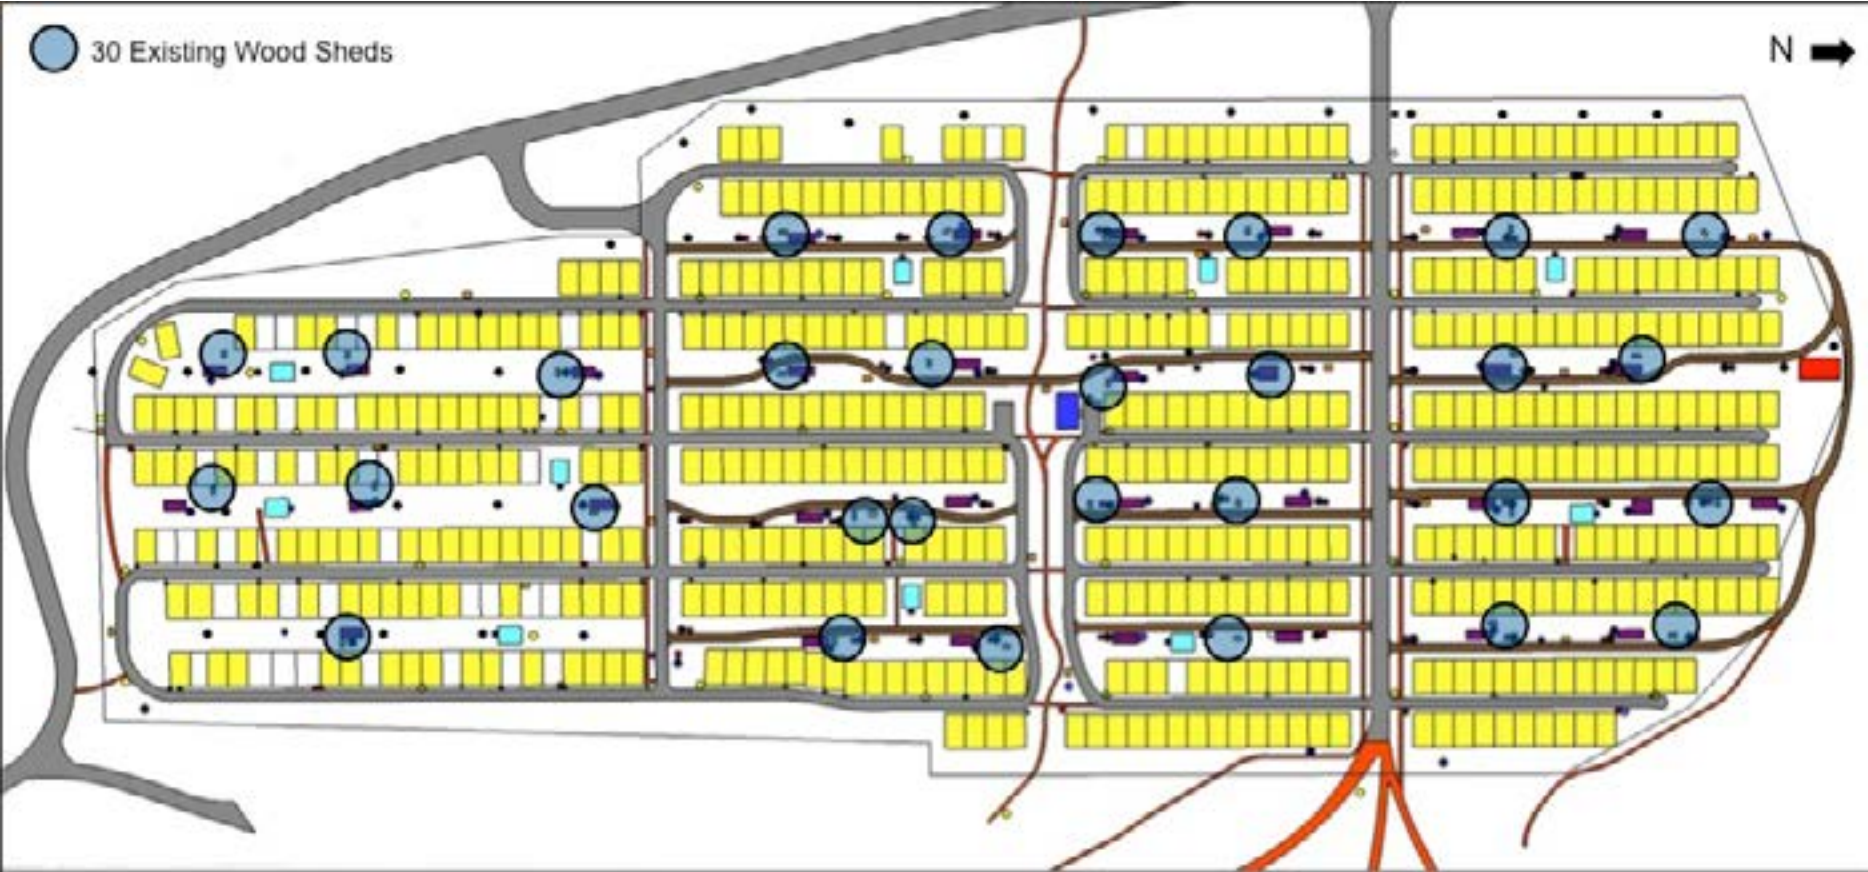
Existing Locations of Wood Sheds at Kitchen Shelters
